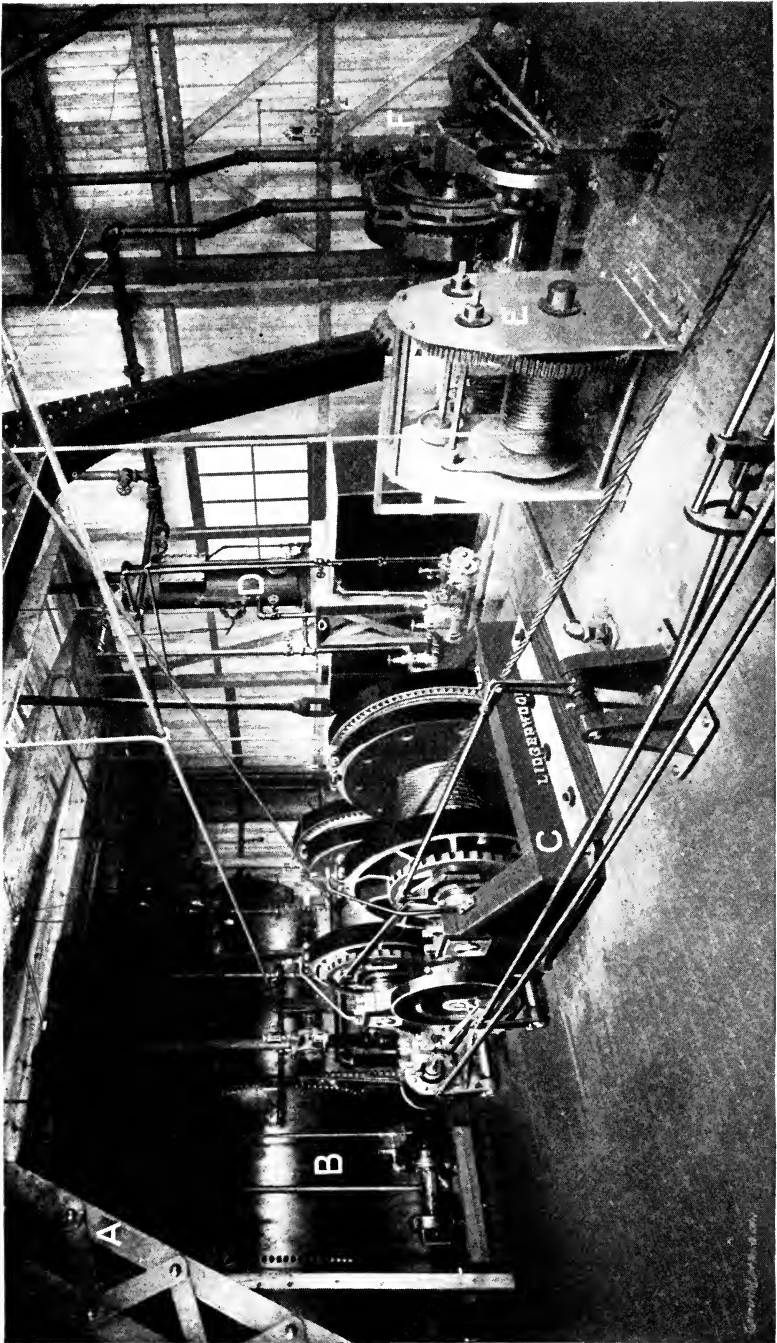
Interior view of engine house of drag-line excavator. A, "A" Frame; B, boiler; C, hoisting engine; D, feed water heater; E, deck winch; F, swinging engine. (Courtesy of Lidgerwood Mfg. Co.)
